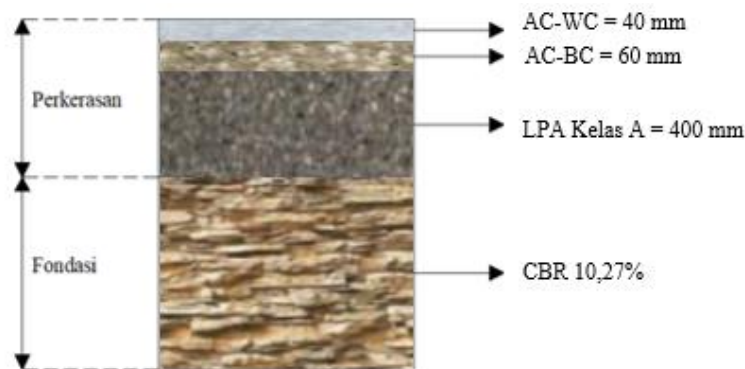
Design sketch of the Wassu-Oma road pavement structure based on the 2017 MDP
